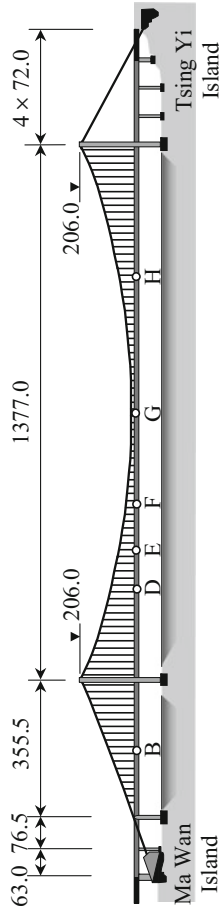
Configuration of the Tsing Ma Bridge (unit: m)
